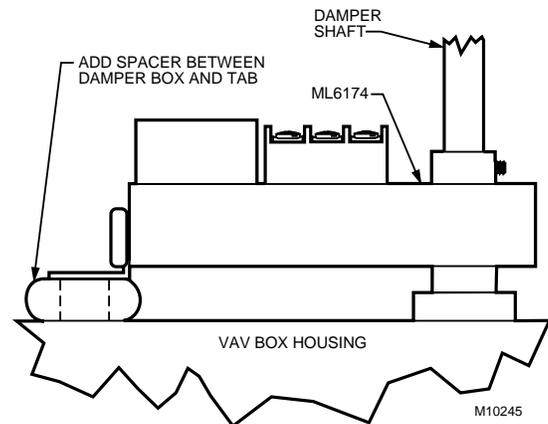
Mounting ML6174/ML7174 to VAV box when actuator is not flush with box.
